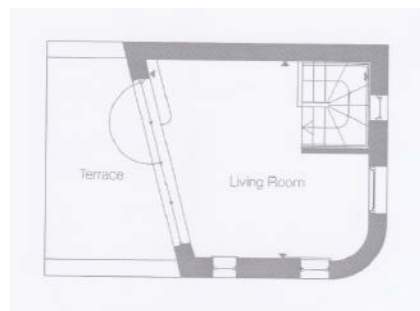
4th floor room, beautifully staged living room connected to terrace
